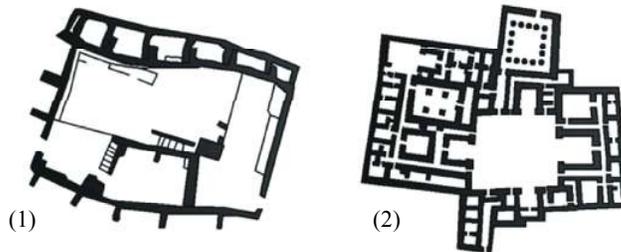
Plan of a House in Tapeh Zagheh (by Authors)
